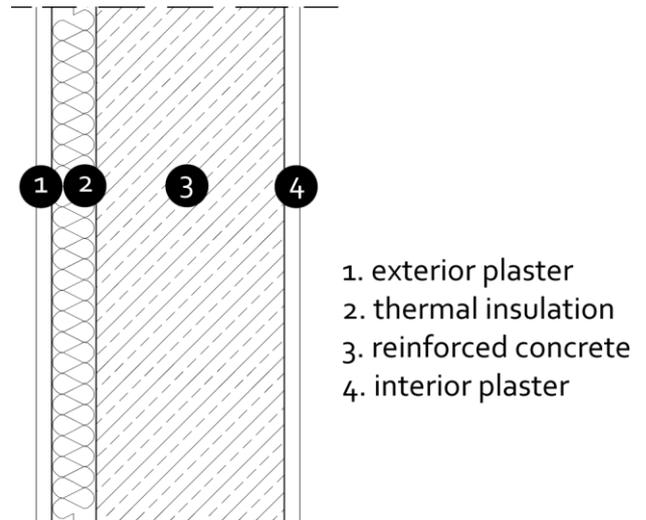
Common practice load bearing structure – Buildings like MF4 (161)
